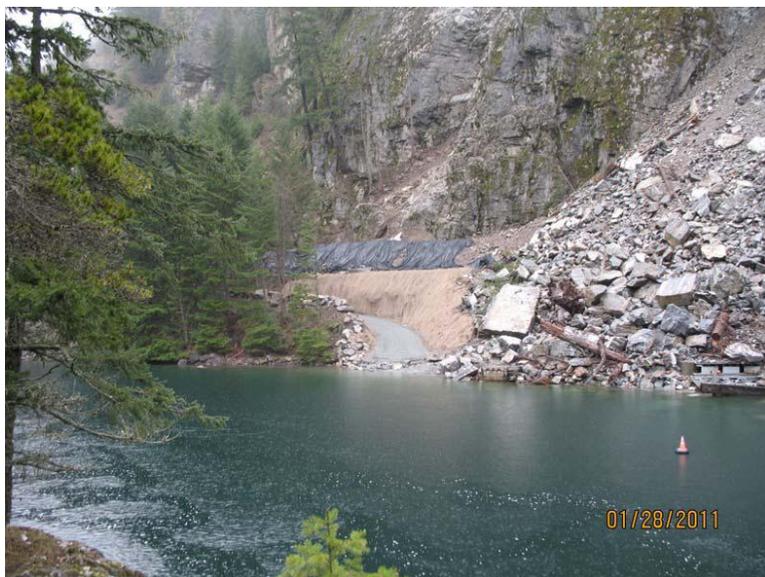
Temporary barge landing and access road constructed after the rockslide to enable heavy equipment access to Ross Powerhouse via barge from Diablo Lake.
